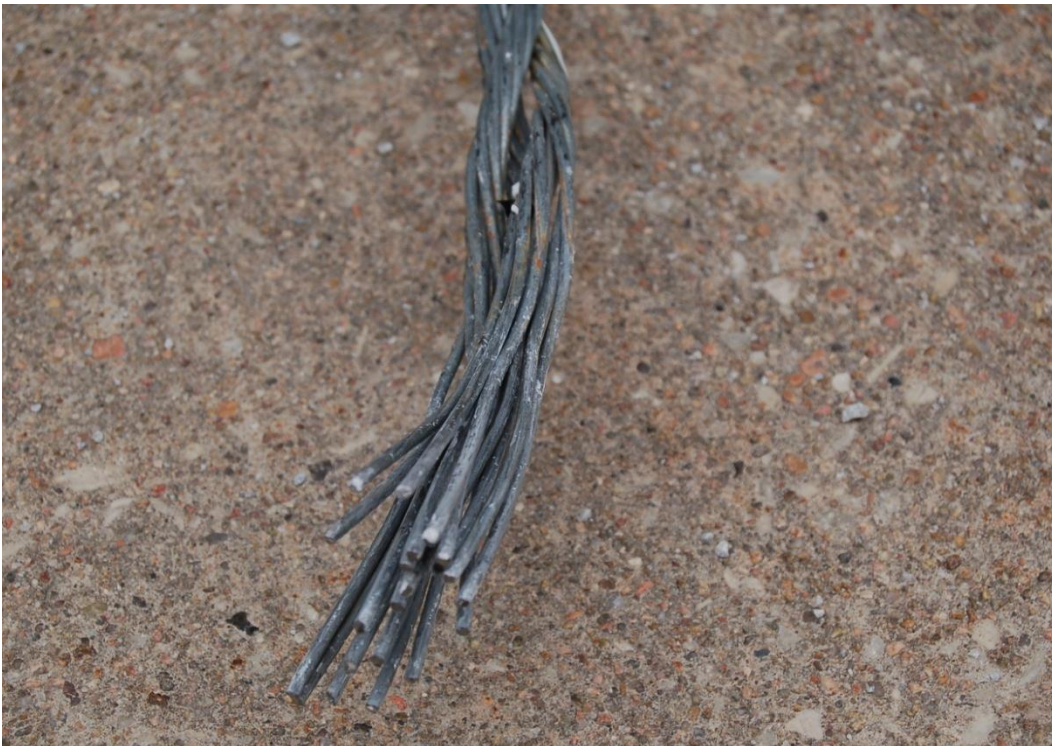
Downstream Wire Rope Pullout, Test No. DTC-2
